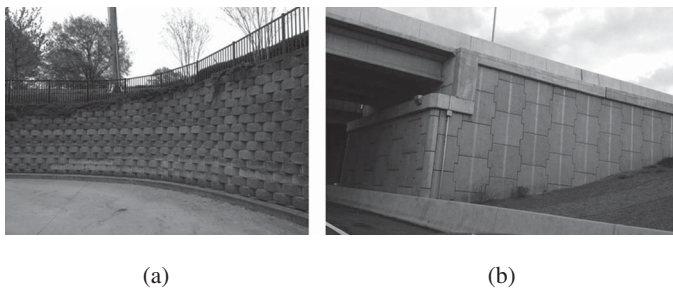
Typical segmental walls in the USA (a) Segmental-retaining wall (b) Reinforced earth wall
